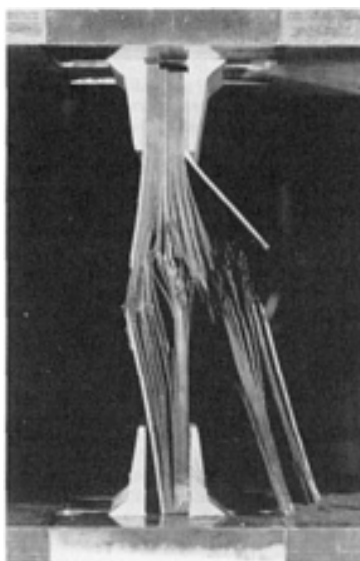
PHOTOGRAPH OF A FAILED SPECIMEN FROM TEST CASE NO. 9 (SEE TABLE 1)
